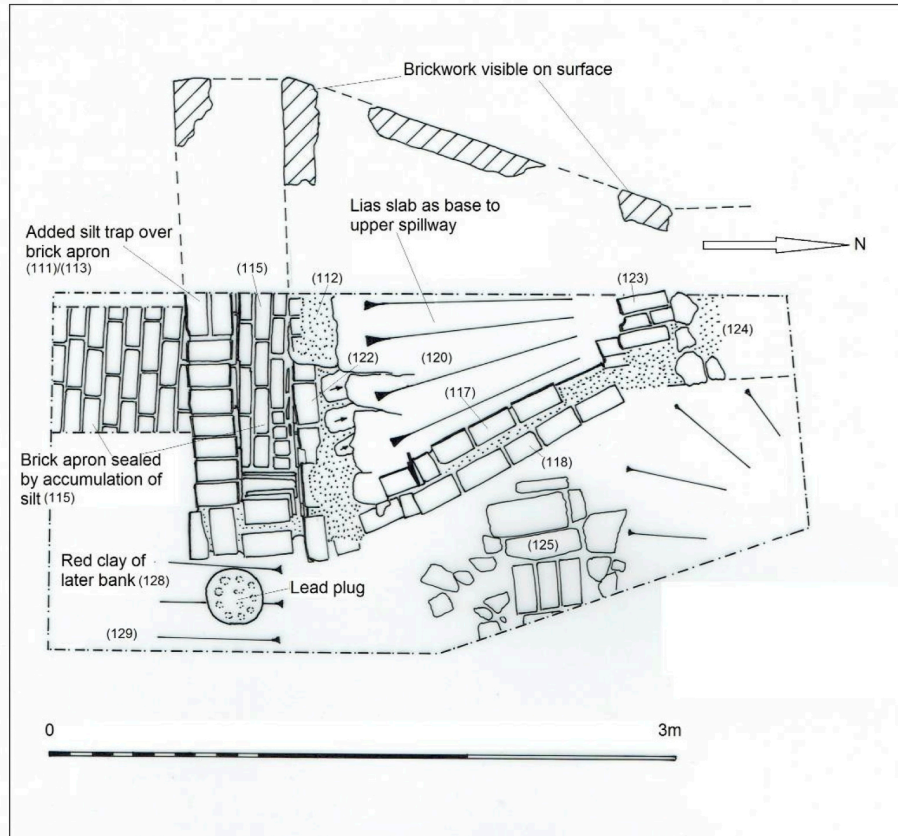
Mill Wood, Goathurst. Trench 1 (Lower Dam), Final Plan
